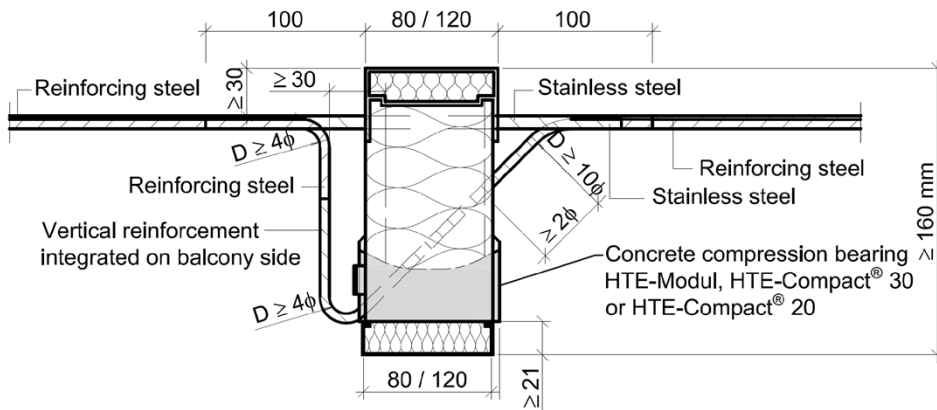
Example of Schöck Isokorb® Type K with CCE
